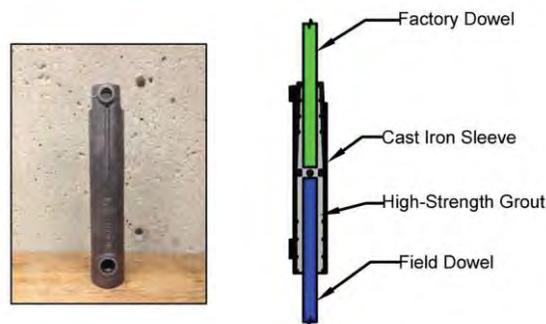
Grouted splice sleeve (GSS) connector used in this study
